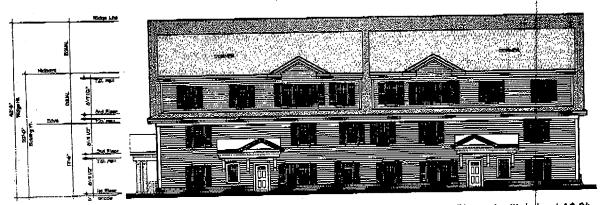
West Elevation facing 5th Avenue. (Composite based upon City Place Site Plan submittal sheet A3.9b. Material notes have been removed for clarity and the dimensions string moved.)
